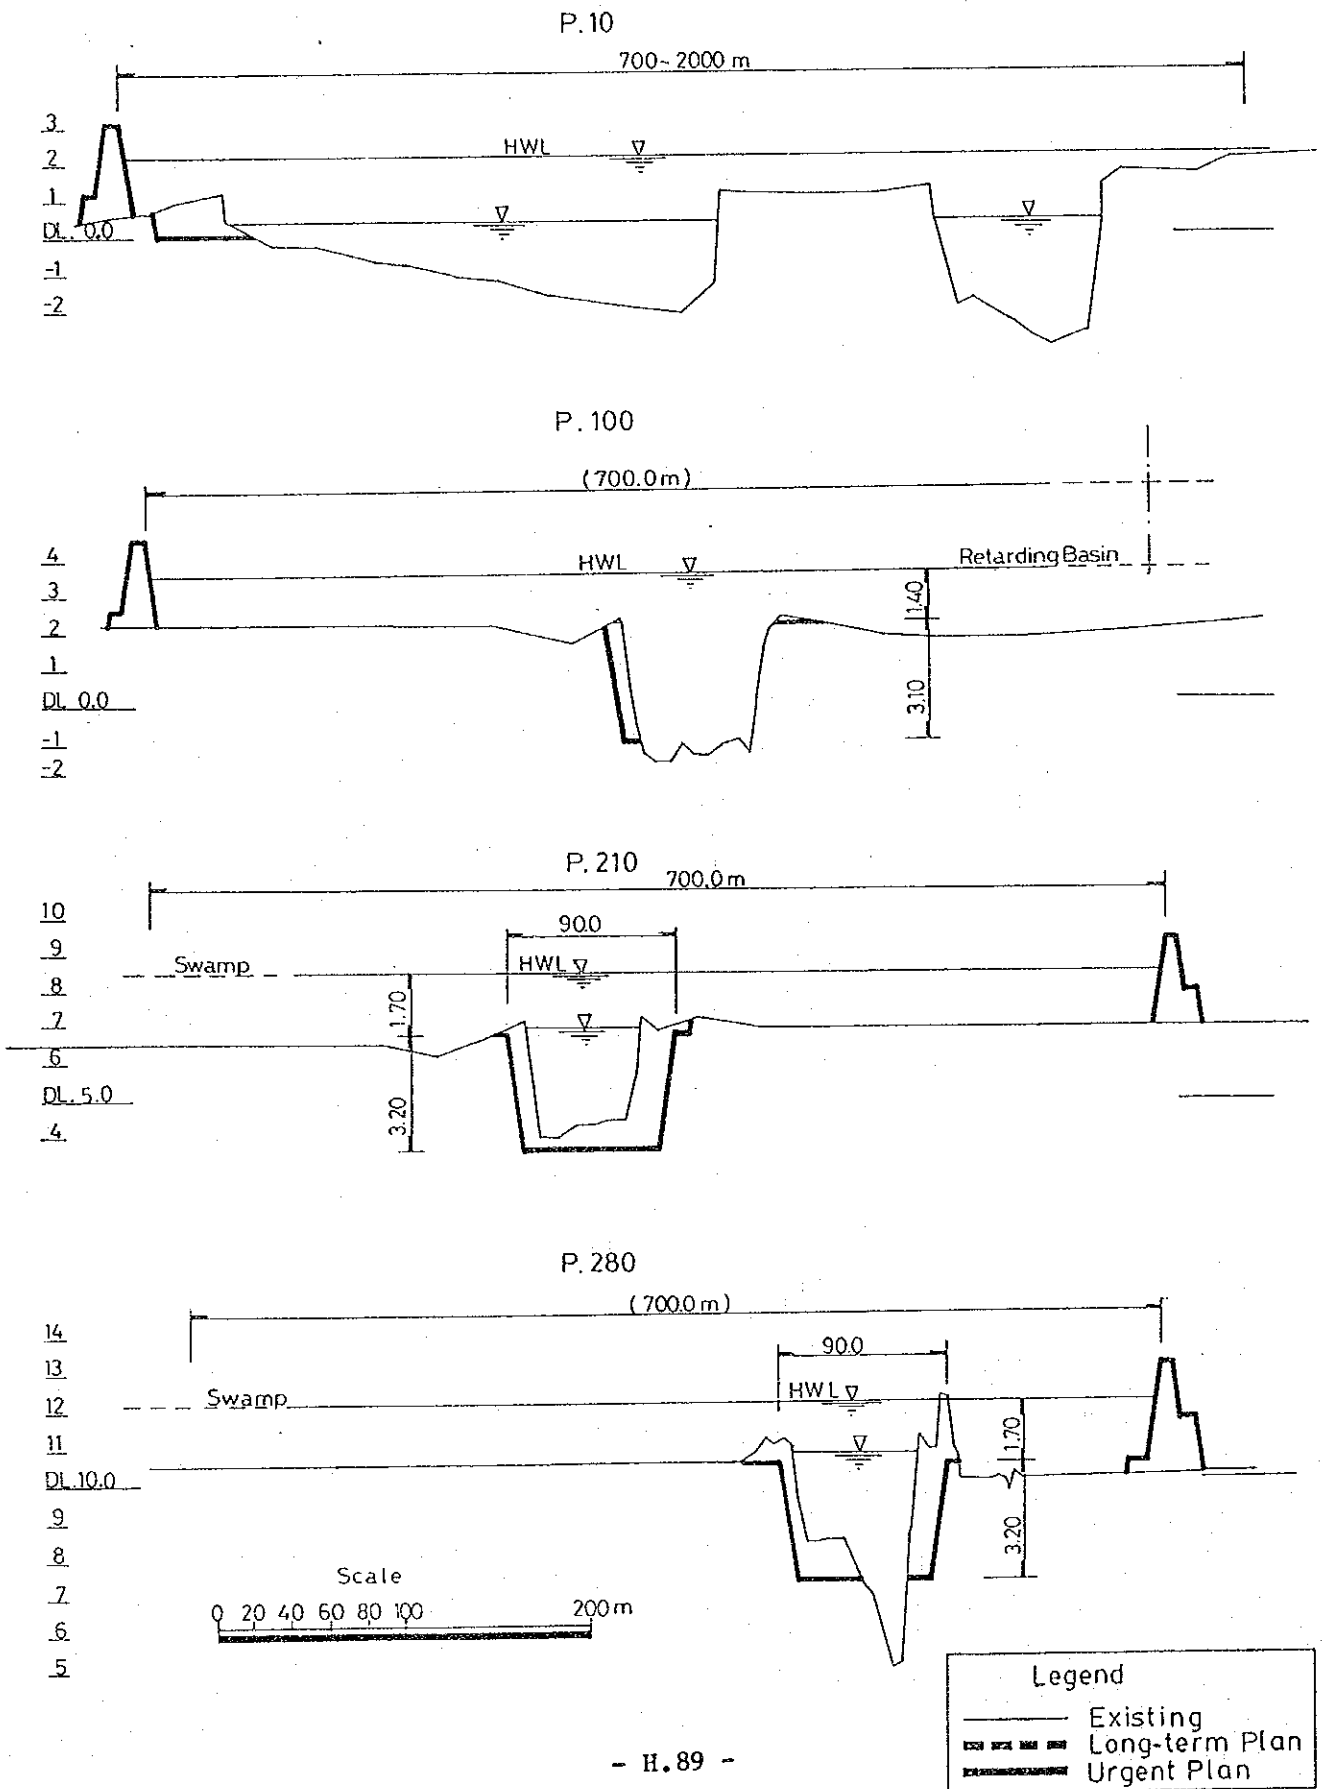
Proposed Long-Term Plan of Asahan and Silidu Rivers (4/6)
